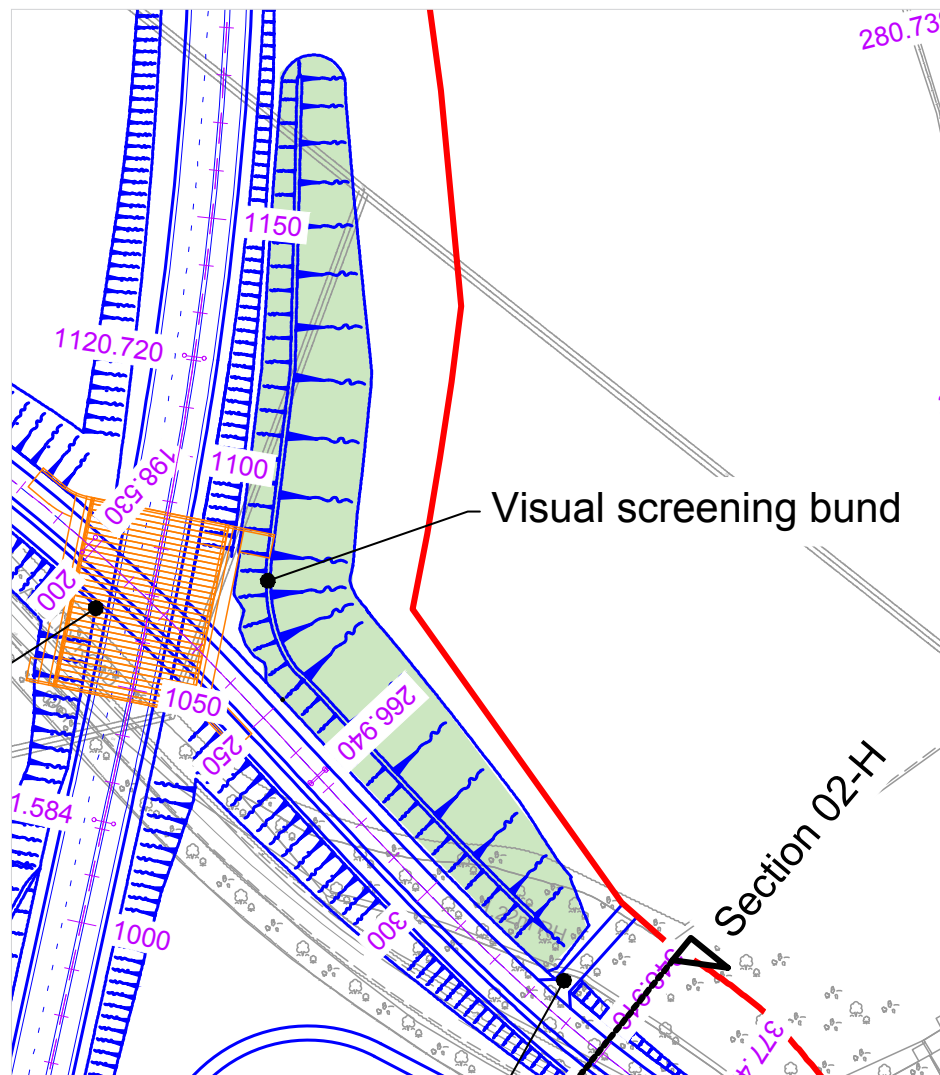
Bunds (highlighted green) at Ardley Bypass and Ardley Road
